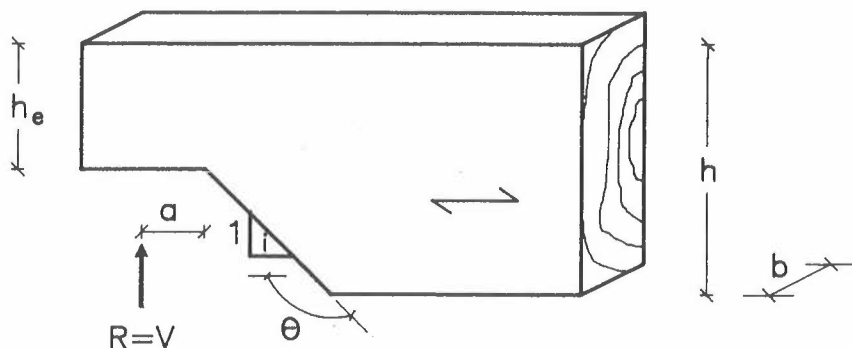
Geometry and statics of the notched end of the beam specimen.
